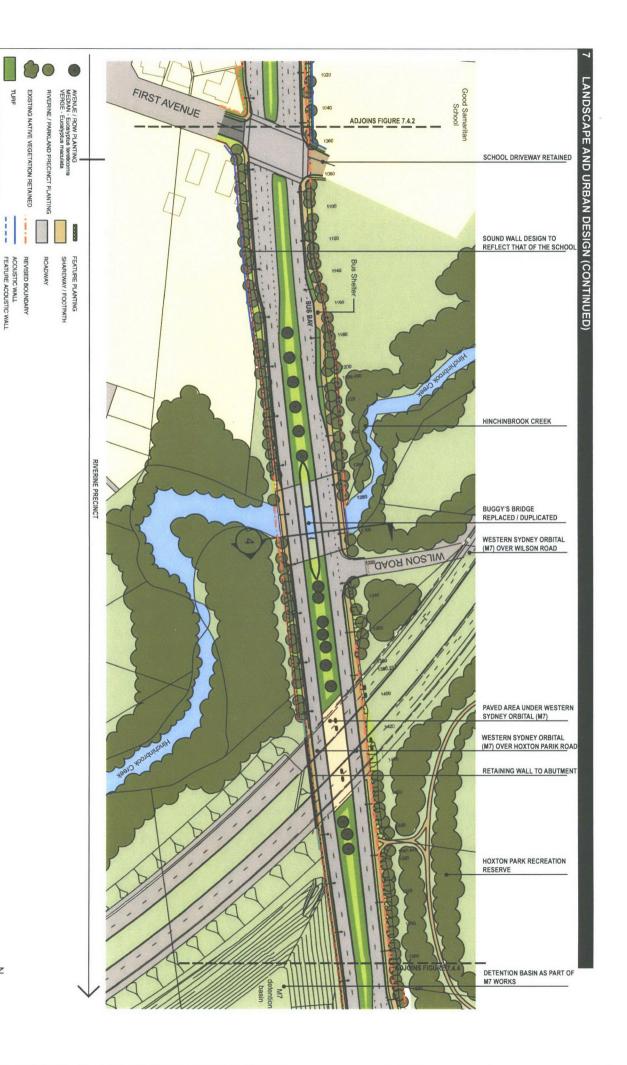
Landscape and Urban Design Concept Plan - Riverine Parkland Precinct
